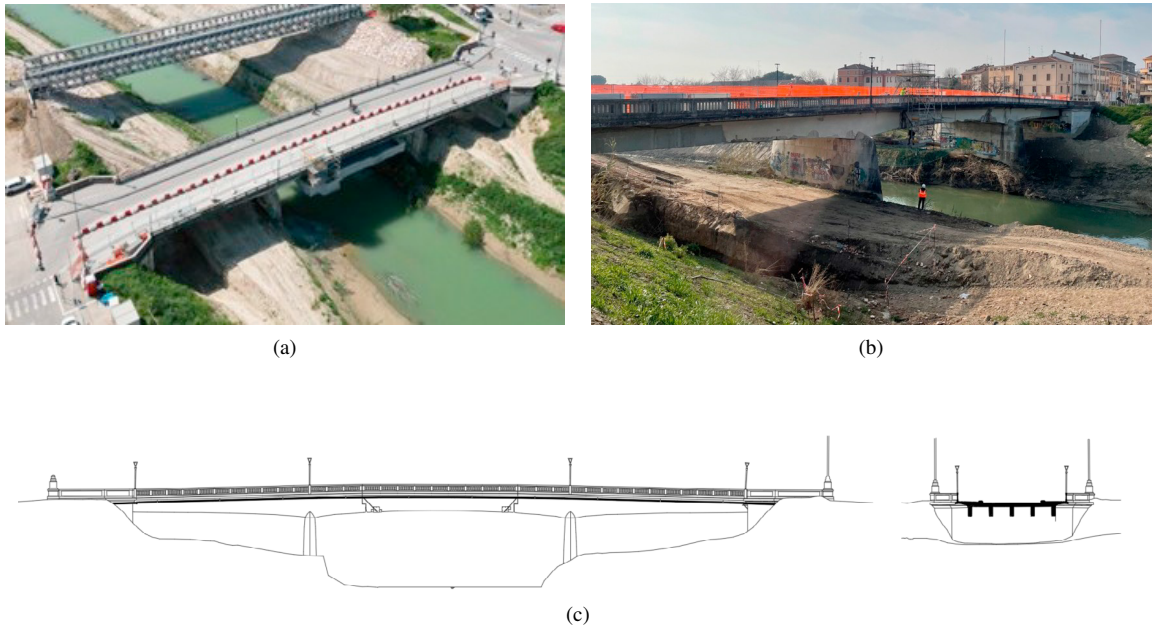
"Ponte delle Grazie" - (a) aerial view; (b) side view; (c) longitudinal elevation and section.
